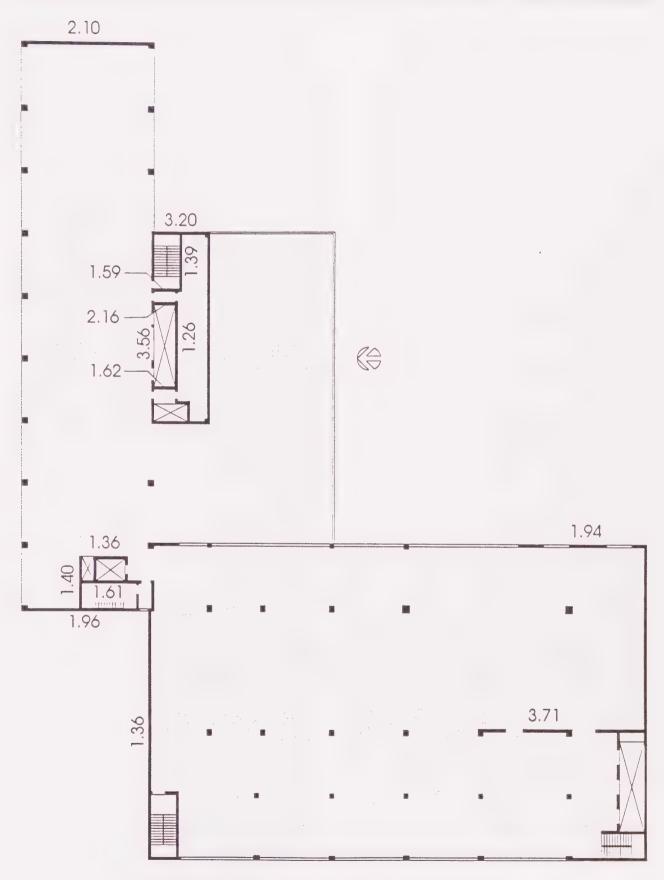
Existing Building 4th Floor Plan with Inelastic Demand/Capacity Ratios
